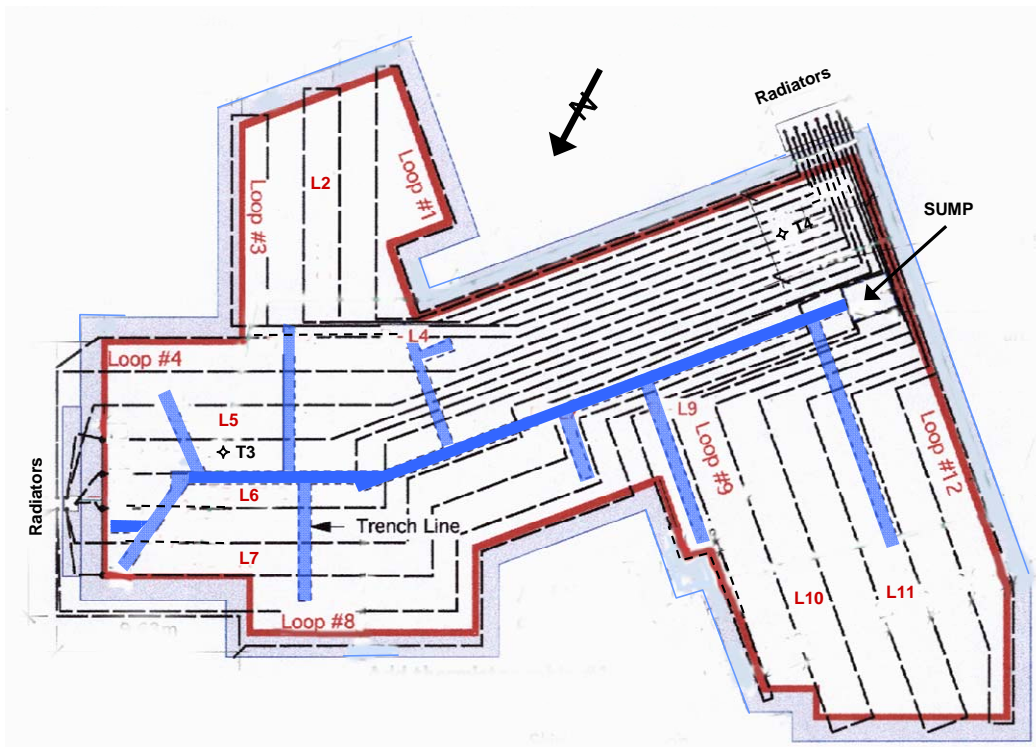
Plan showing the layout of evaporator piping and trenches, FYOF, Inuvik, NT
